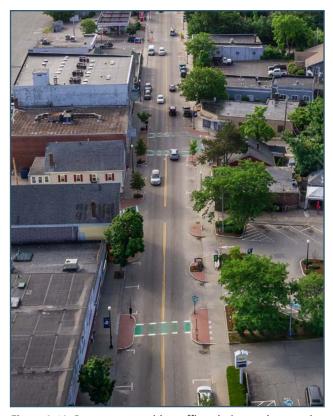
Bumpouts provide traffic calming and protection for pedestrians crossing Main Street in Wareham Village.
